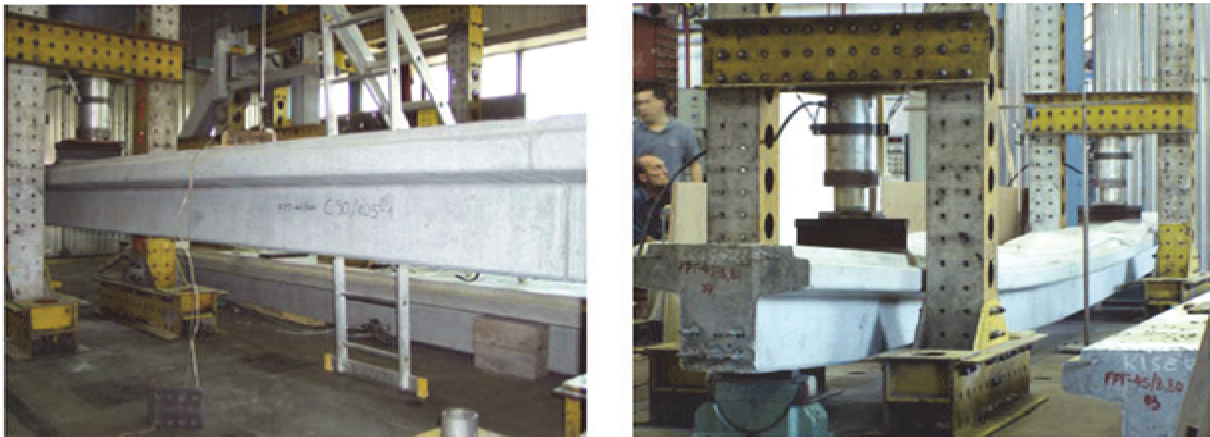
Load tests of the C90/105 concrete quality test bridge girders at the Budapest University of Technology and Economics
